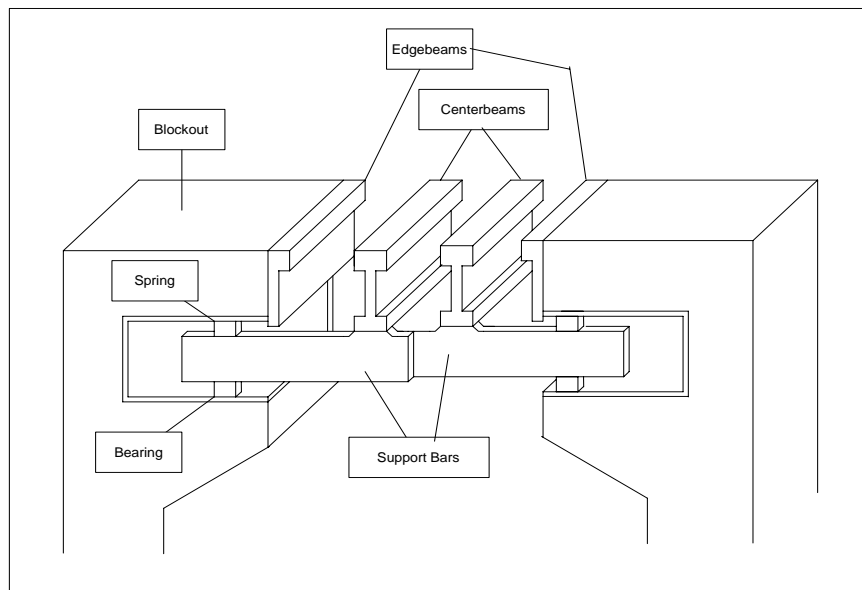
Cut-Away View of Typical Welded-Multiple-Support-Bar (WMSB) Modular Bridge Joint System (MBJS) Showing Support Bars Sliding within Support Boxes (Seals are not shown for clarity).
